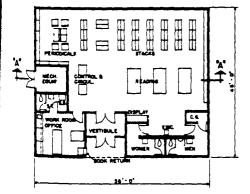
Fleer plan of a library. Source: U.S. Naval Facilities Engineering Command, Department of the Navy, Washington, D.C.
